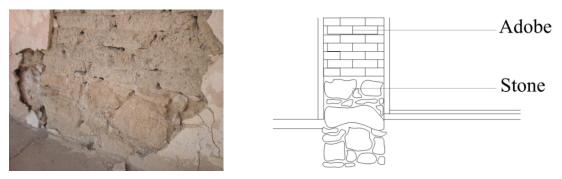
Adobe and stones in construction of wall in House 2 (Author, 2012)
